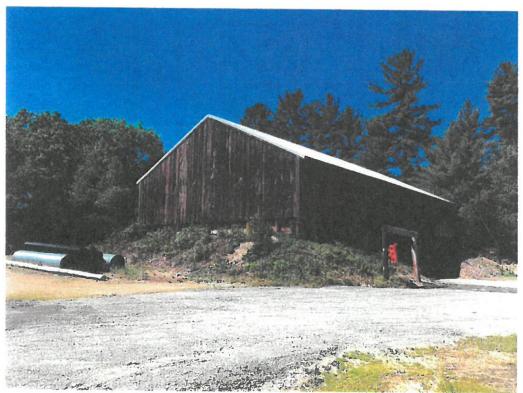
Loudon 316 – Sand fill used to hold push walls in place.
